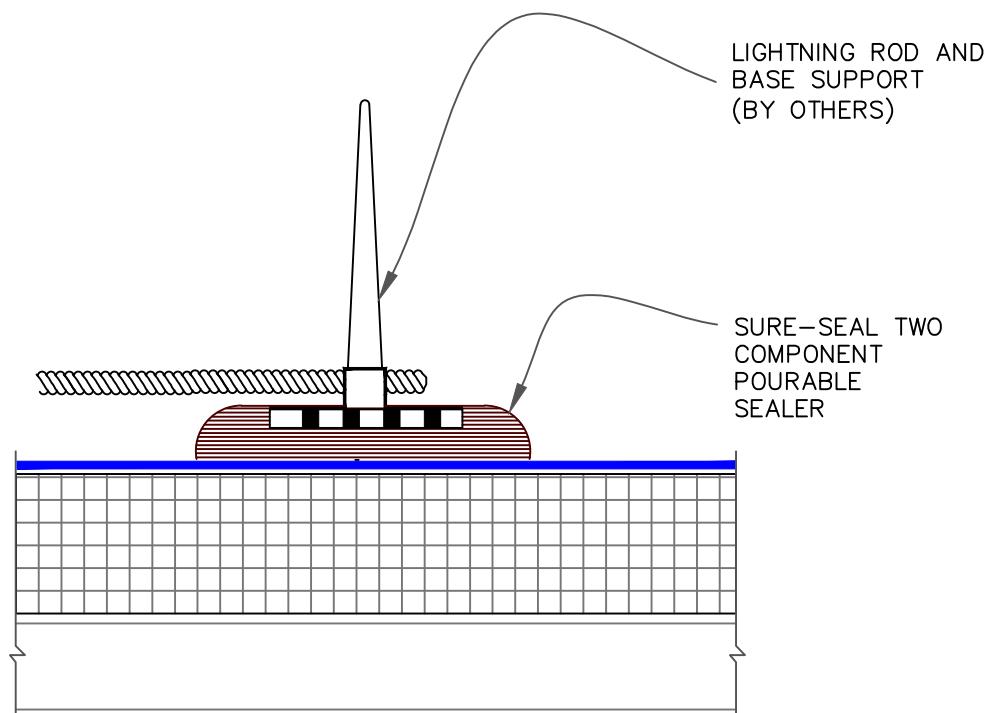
DETAIL UNACCEPTABLE FOR HORIZONTAL APPLICATIONS ON ROOF DECK.
